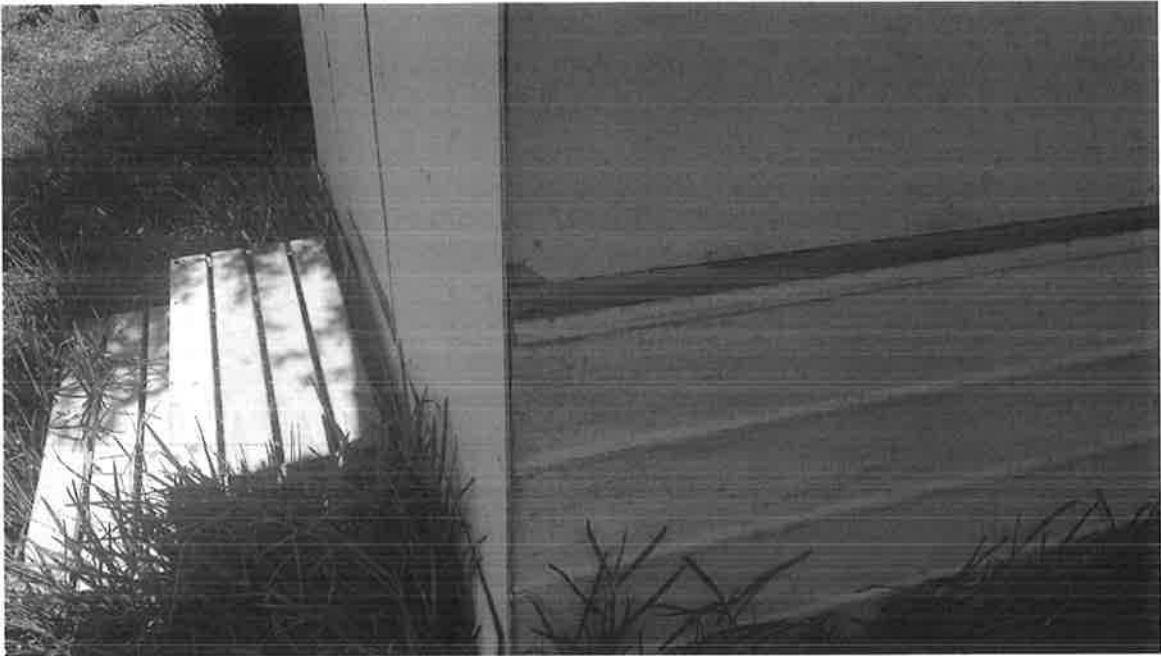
Residential building located at 71 Kerrs Road, Lidcombe NSW (the site).
